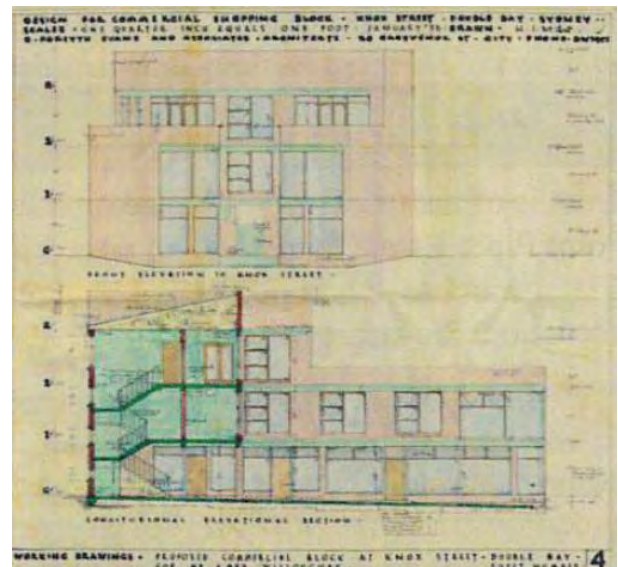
Architectural drawing showing primary (south) elevation and section prepared by Douglas Forsyth Evans and Associates for the subject site, c.1955.
